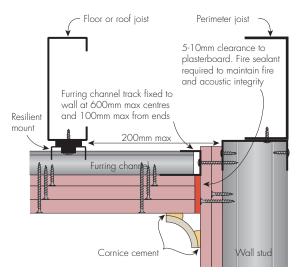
Fire Rated Ceiling to Wall Resilient mount and furring channel
